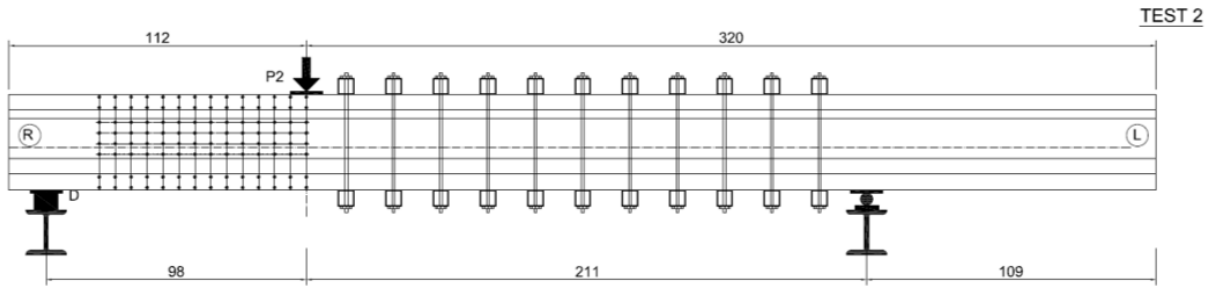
Girder 1-Test 2 configuration (dimensions in inches)
